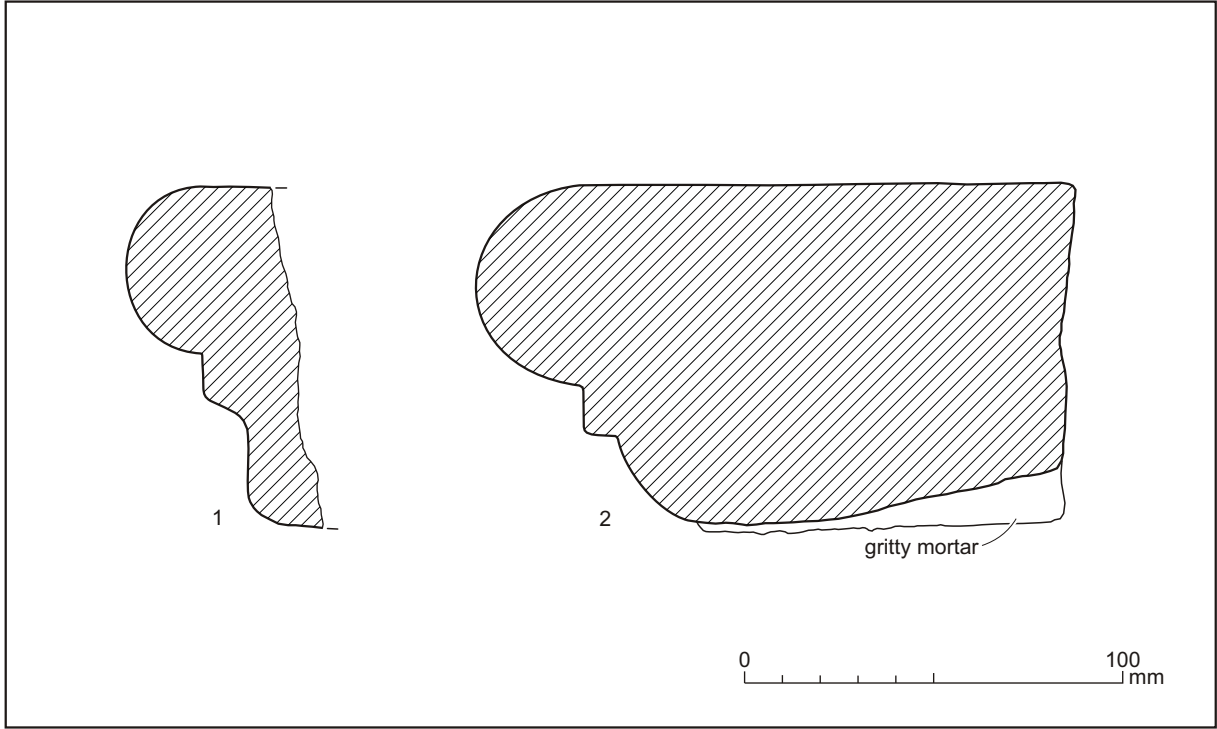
Two fragments of architectural moulding recovered from the core of the collapsed graveyard wall at St Peter's Church, Tawstock, North Devon. Scale 1:2.
